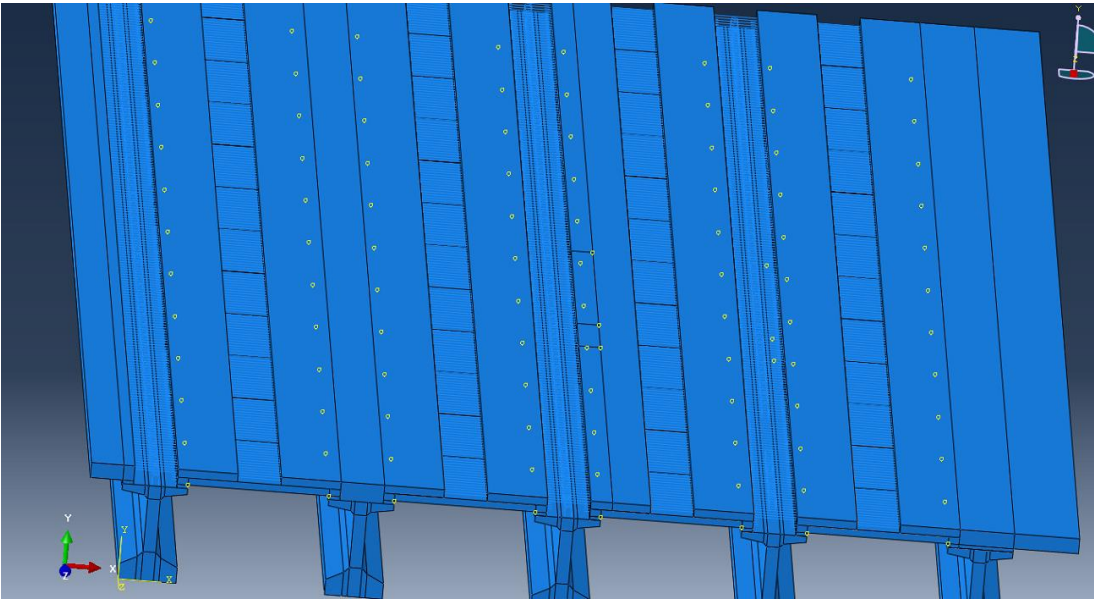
12: Recasting on the girder lines and the pane line with additional R rebars (R3)
